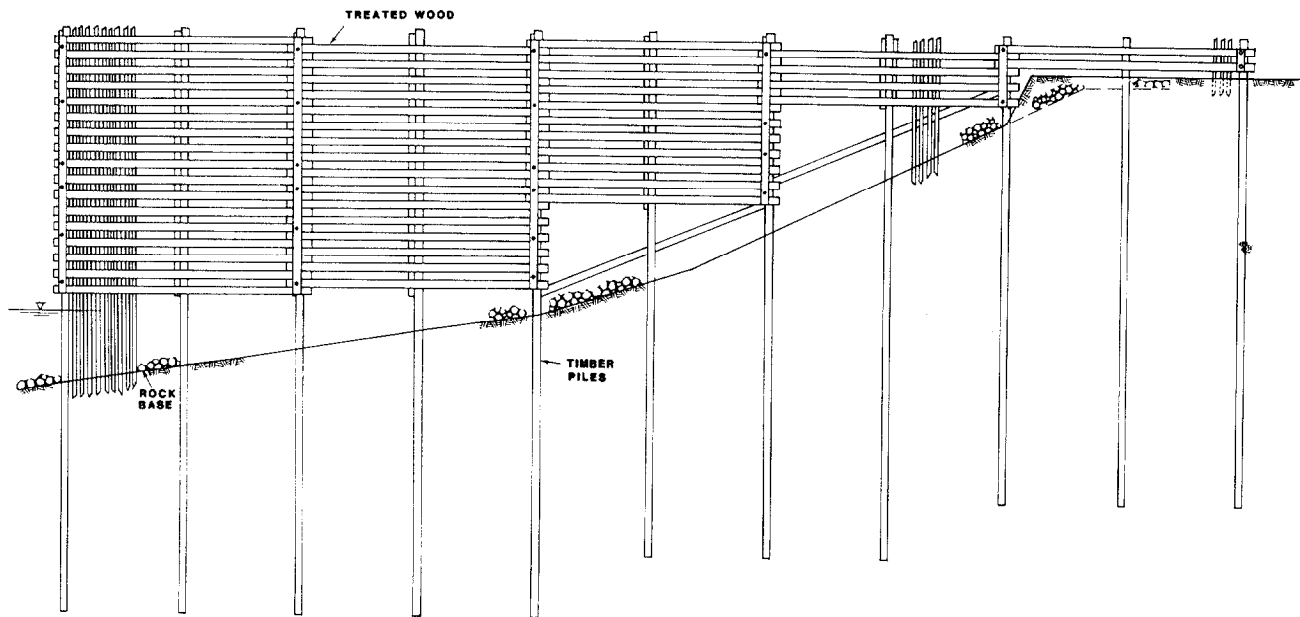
TYPICAL DESIGN SKETCH FOR TIMBER-PILE AND WOOD PLANK RETARDANCE/DIVERTER SPUR.
